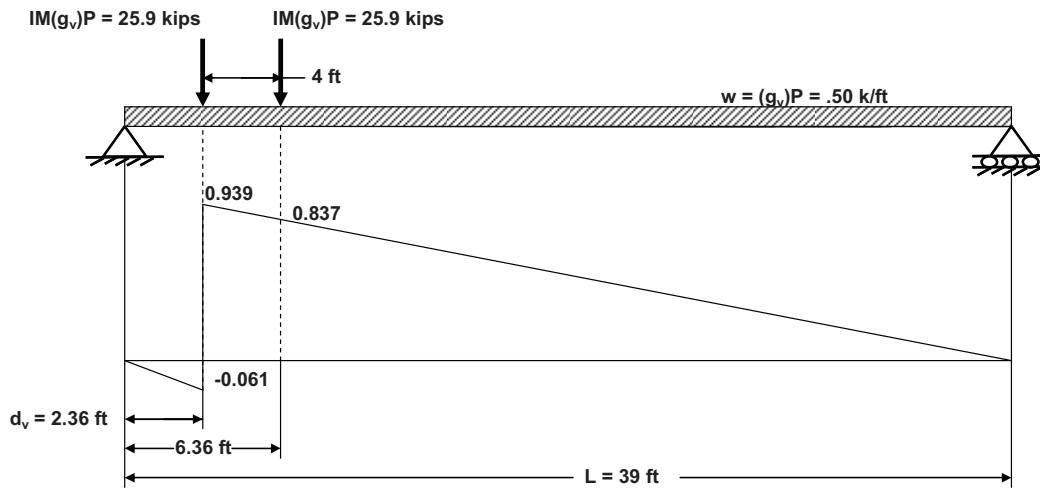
Exterior Beam Shear Design Tandem at  $d_v$
